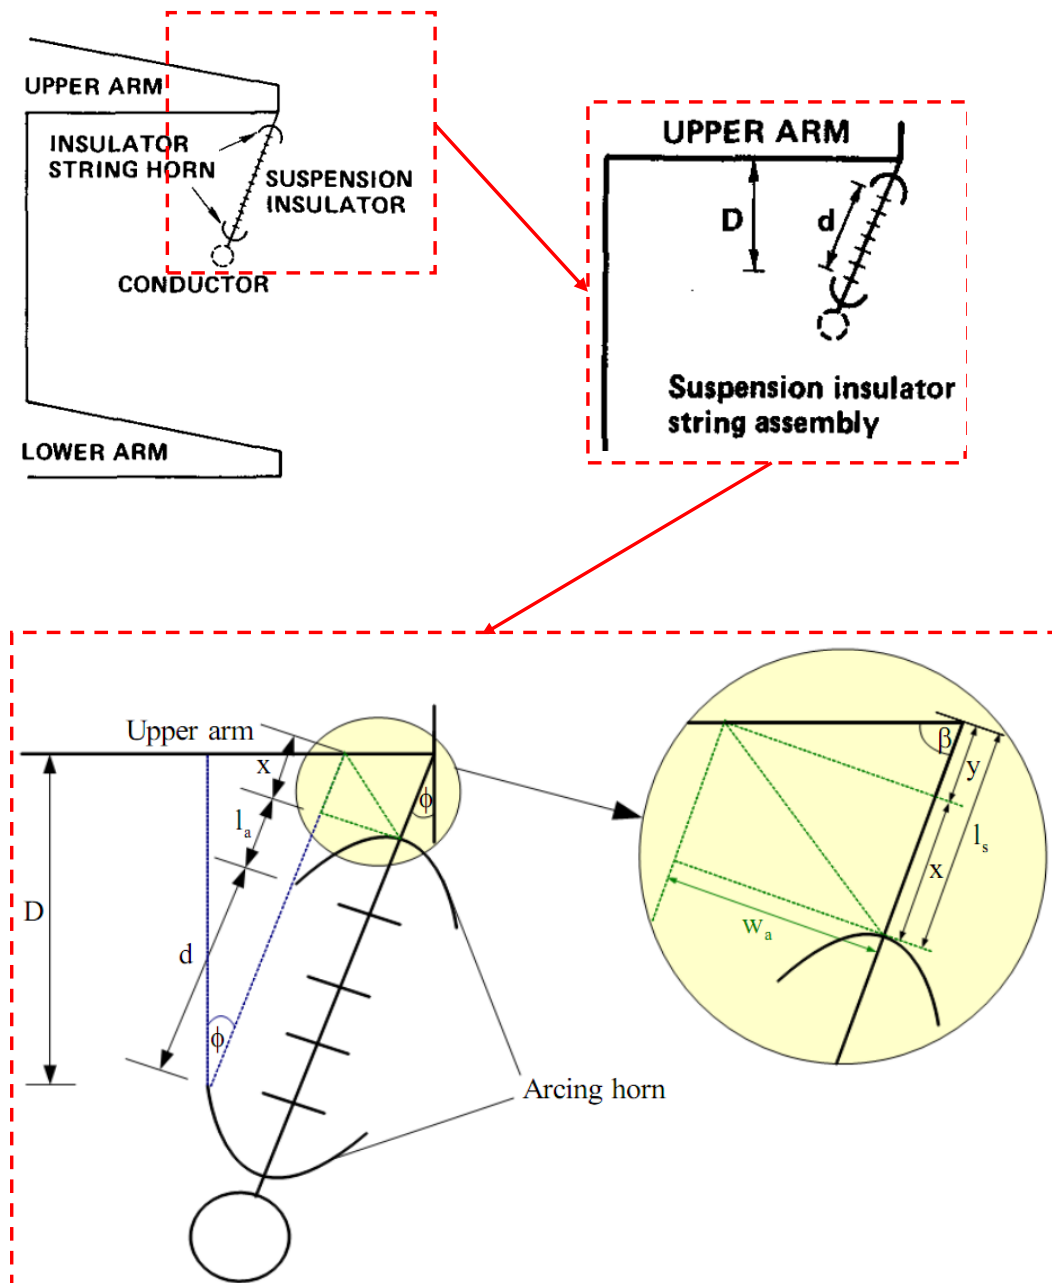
Typical Construction of a suspension insulator string assembly and detailed figure of suspension insulator assembly (adapted from [24])
